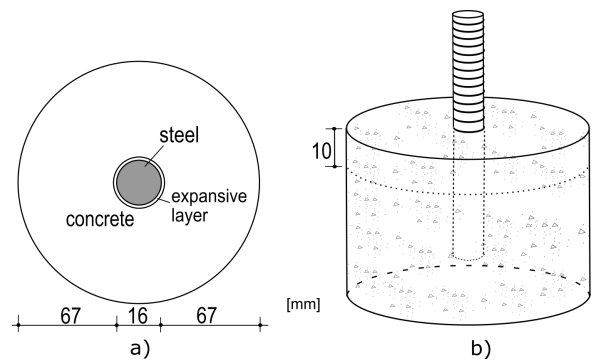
Concrete specimen: a) top view of a 10 mm slice of the concrete cylinder with the steel bar in the centre, b) 3D geometry of the cylinder with the steel bar.
